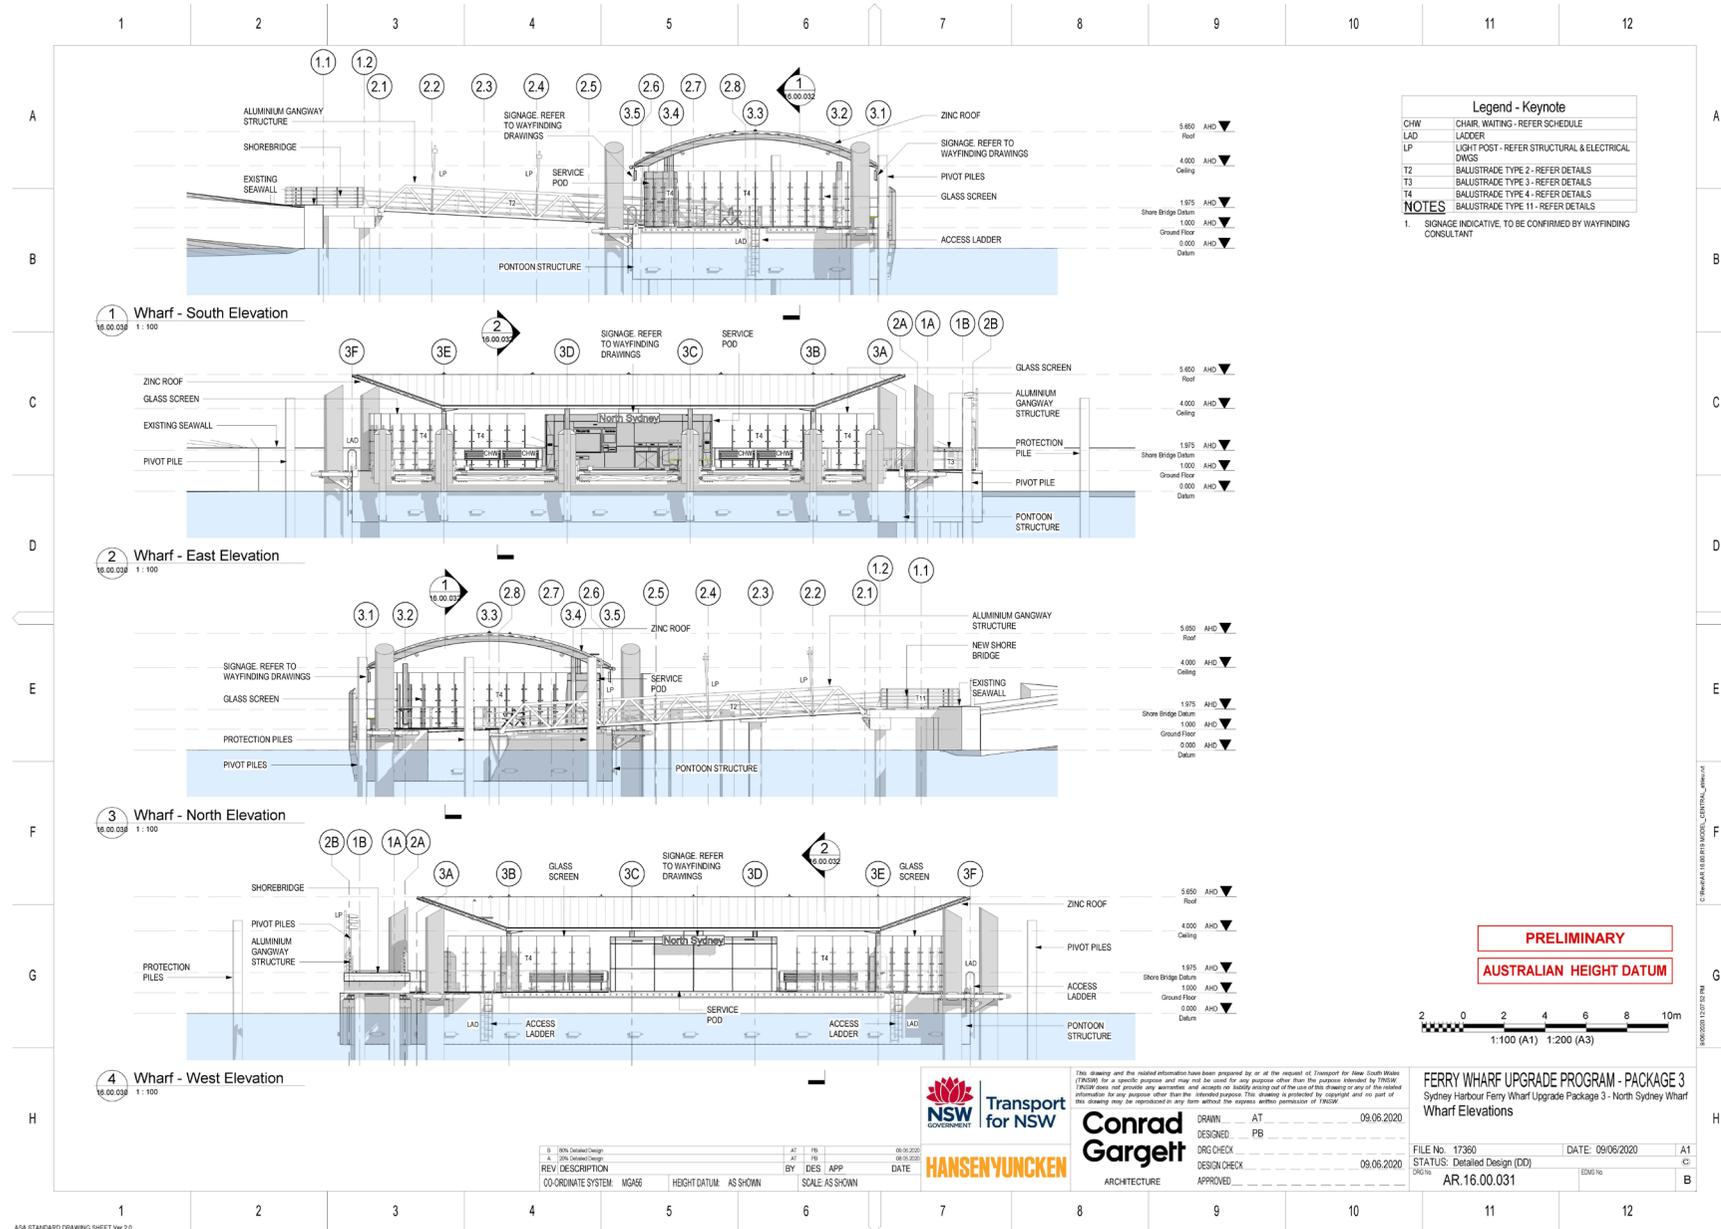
Architectural Elevations (Source: Hansen Yuncken and Congrad Gargett)
